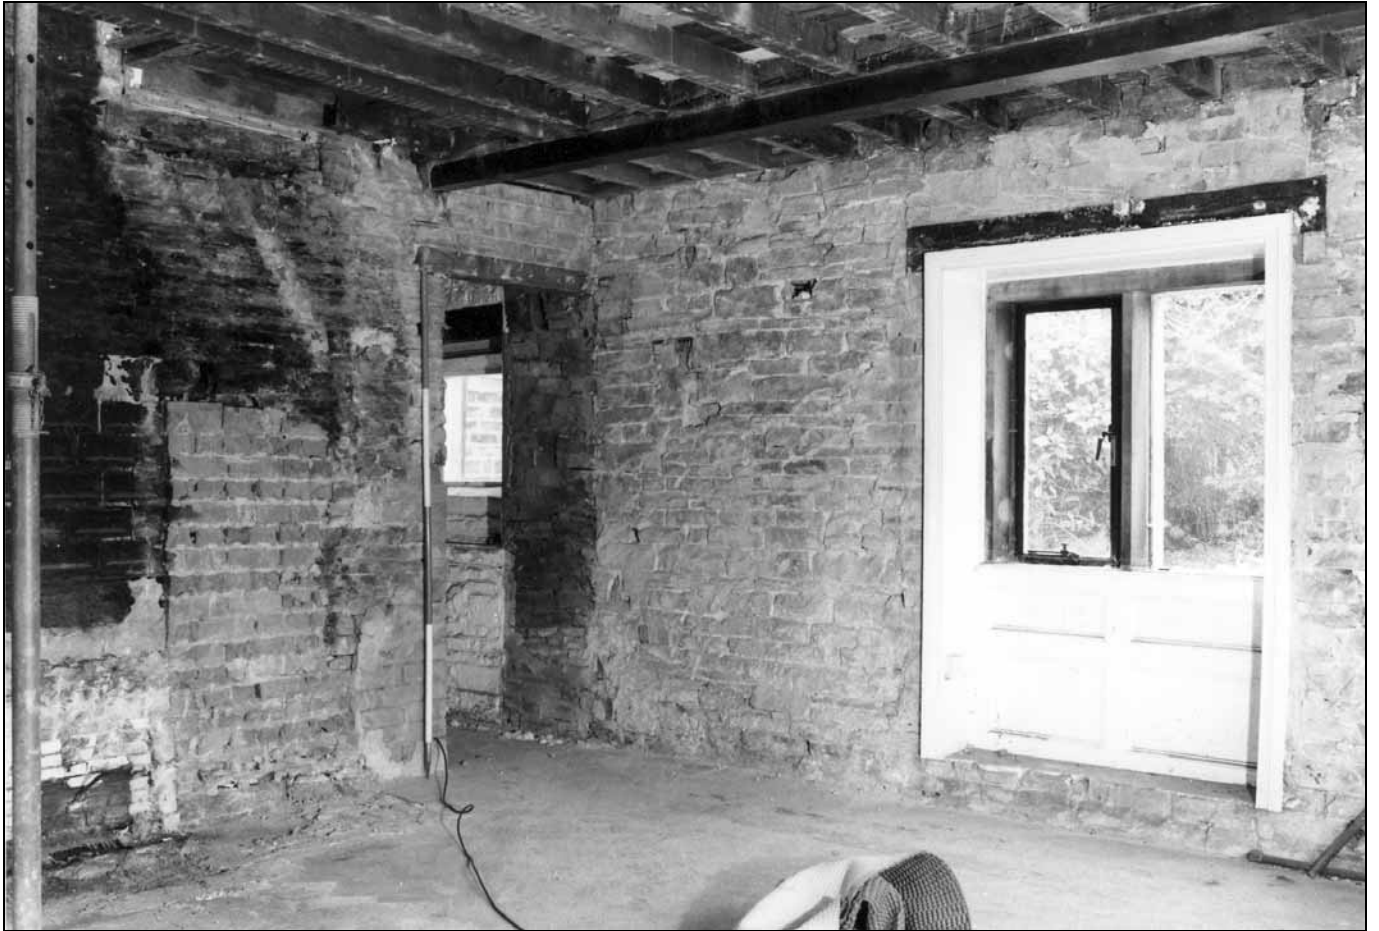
Ground floor of 18th/19th century extension, looking south-west (film 2, frame 1)
